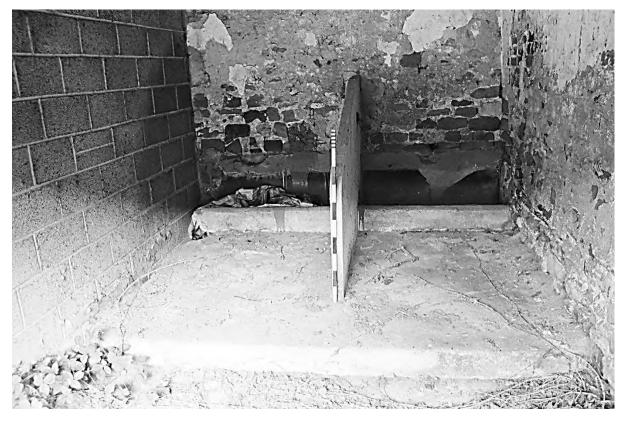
Farm Building 1 South: Room 1.5 Stall, Manger & Drain (Film 1/29). Facing East.
